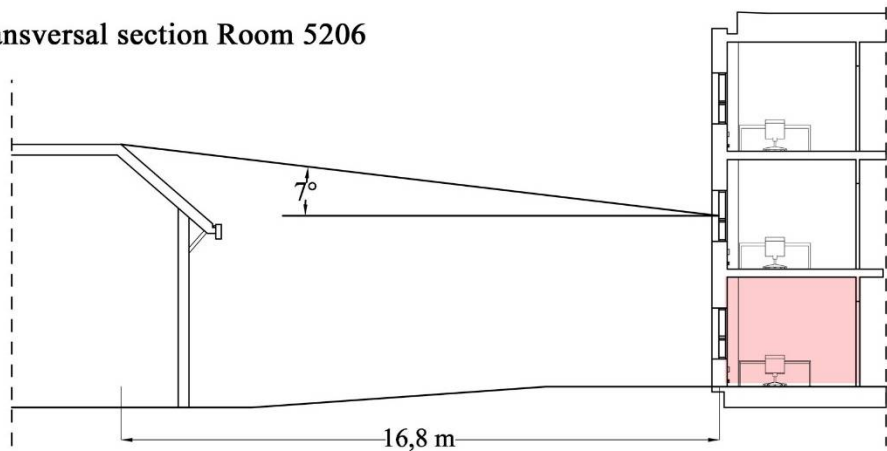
Obstruction angles on the horizontal for the five analysed rooms.
